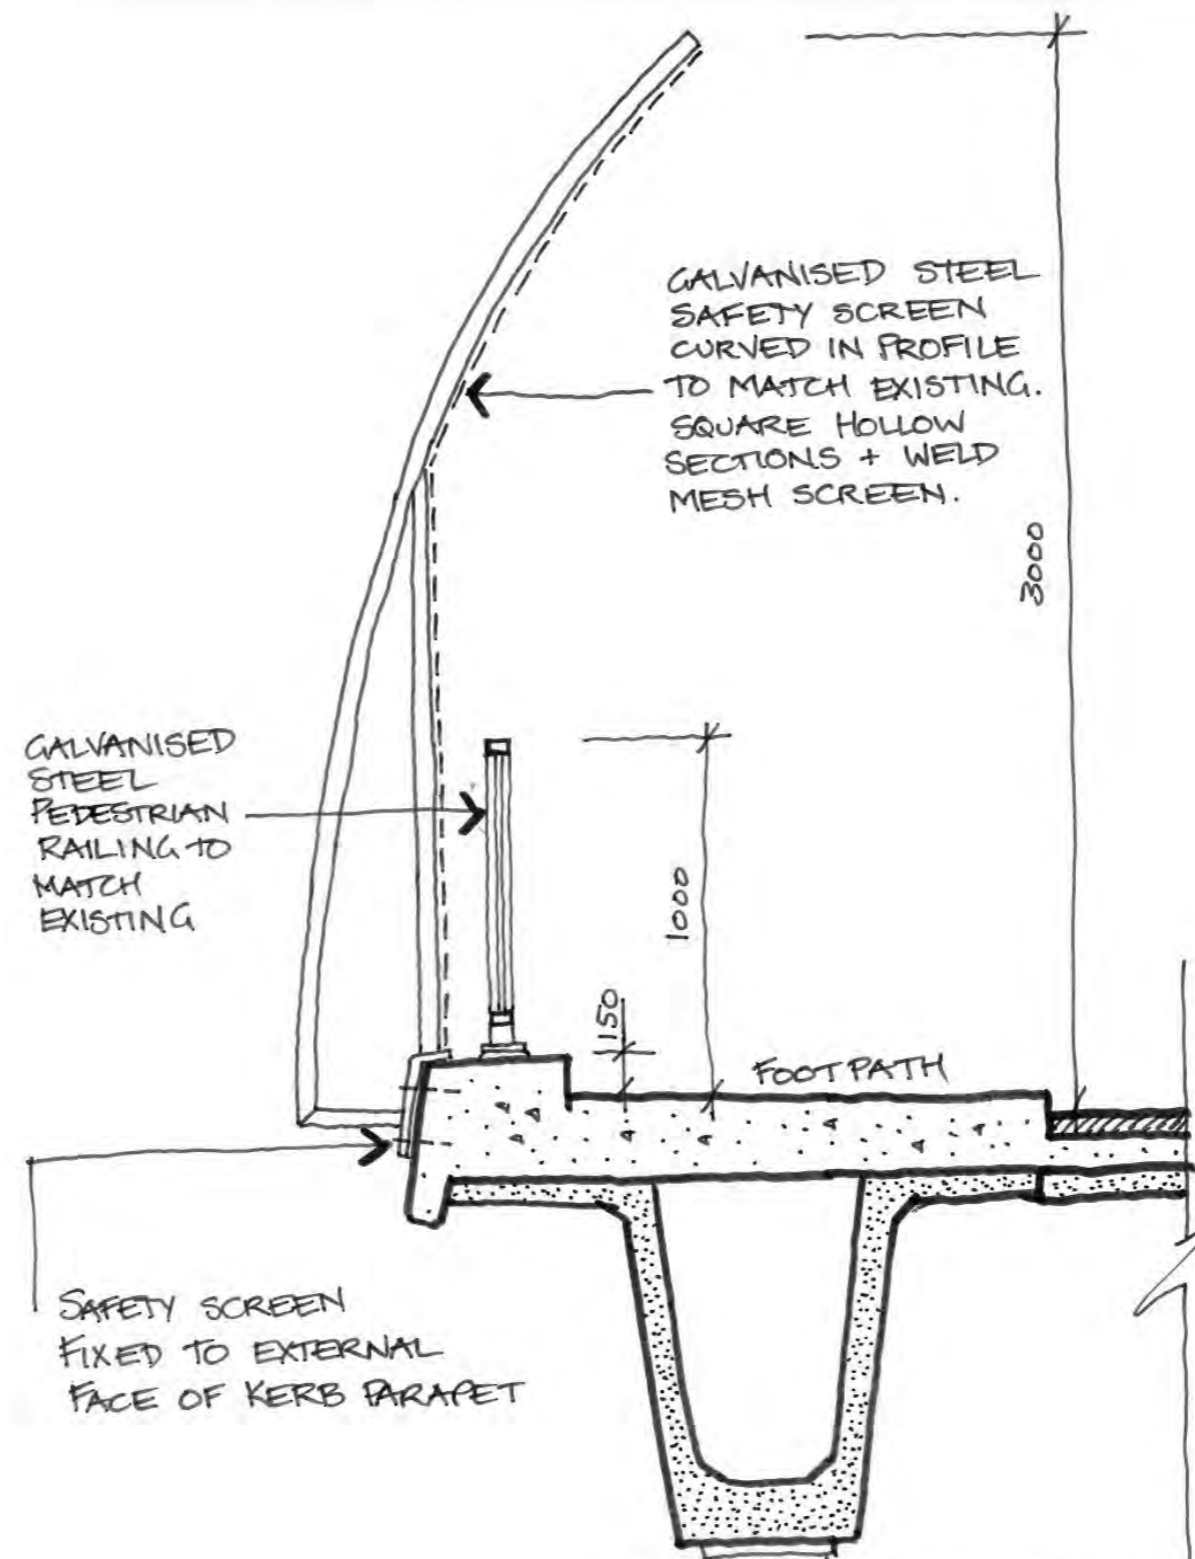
Typical Bridge - Parapet Detail on Kirkham Street Bridge
